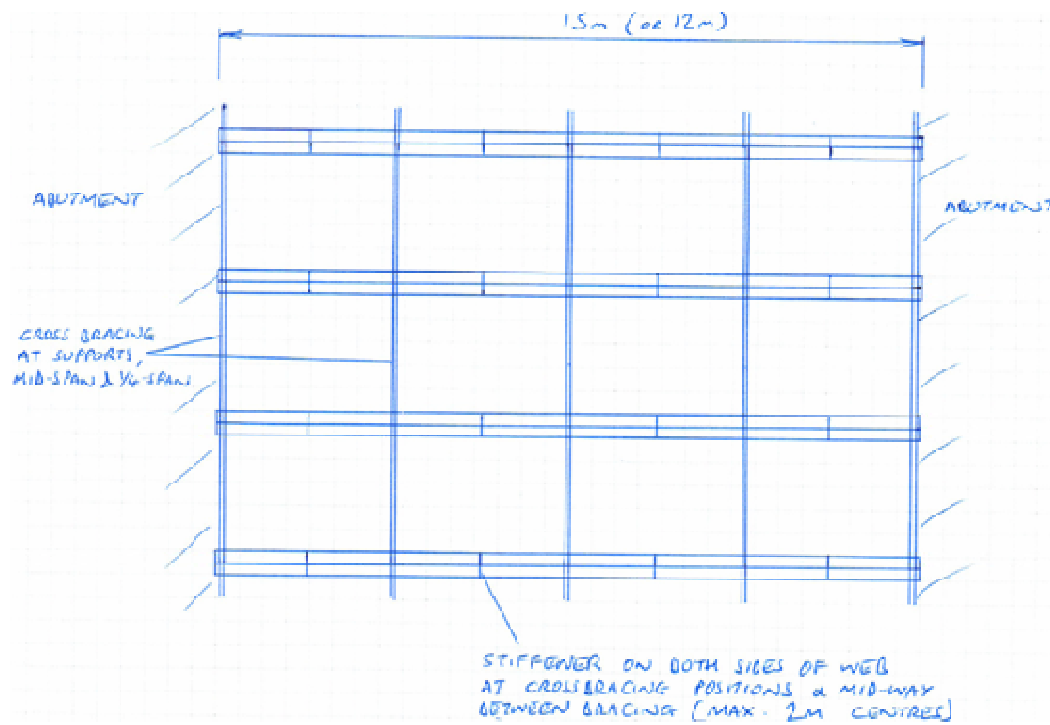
Stiffeners and bracings for the bridge geometry
